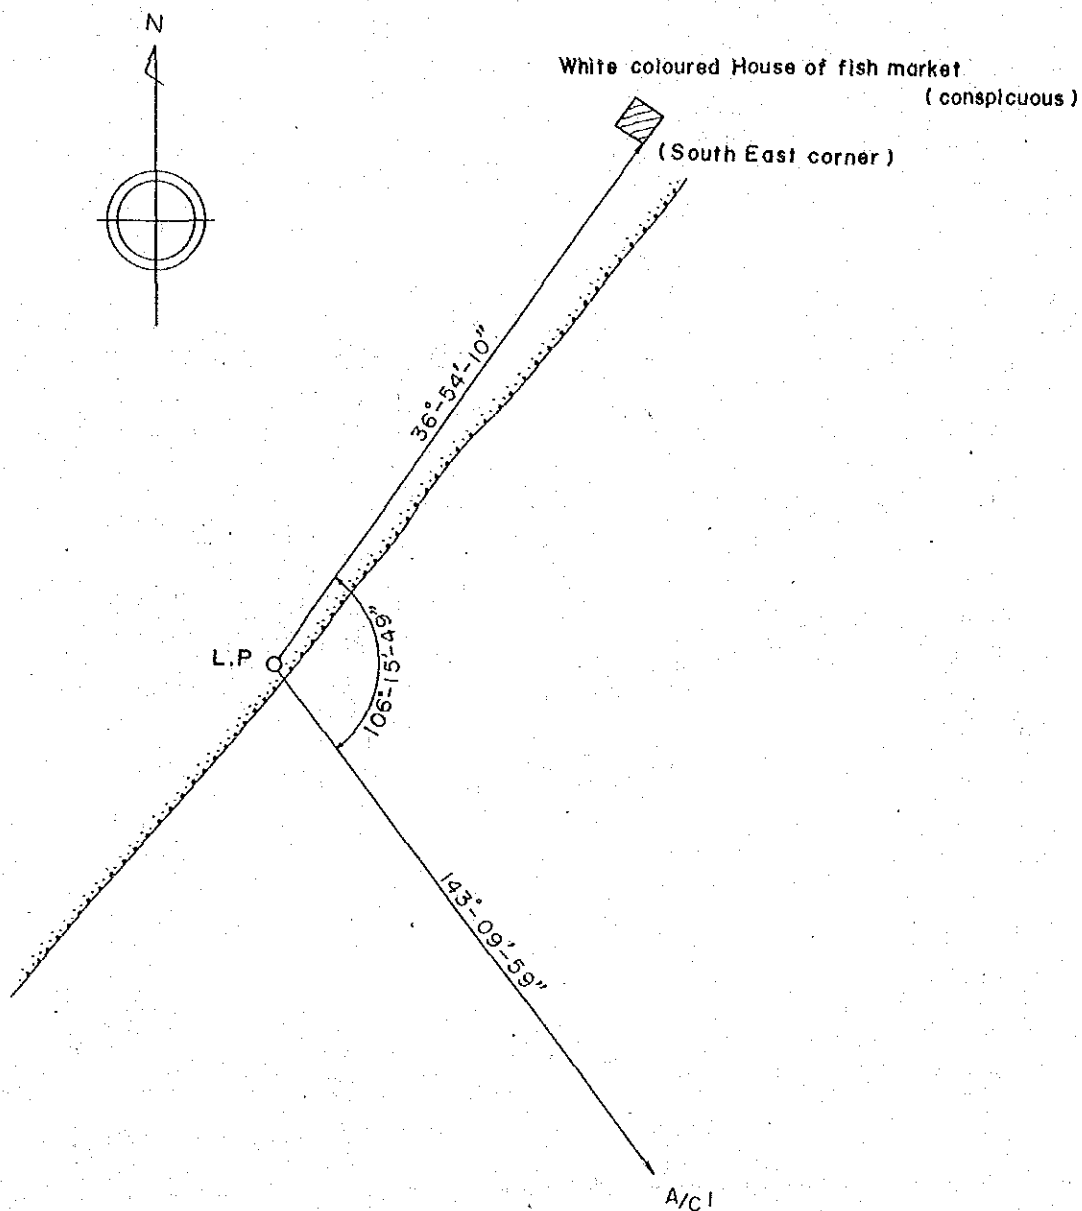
(b) BEARINGS OF CABLE ROUTE IN KUANTAN
